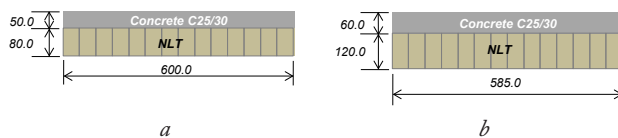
Cross-section of DBP2 panels with the length of a) 4.5 m and b) 6.0 m.
